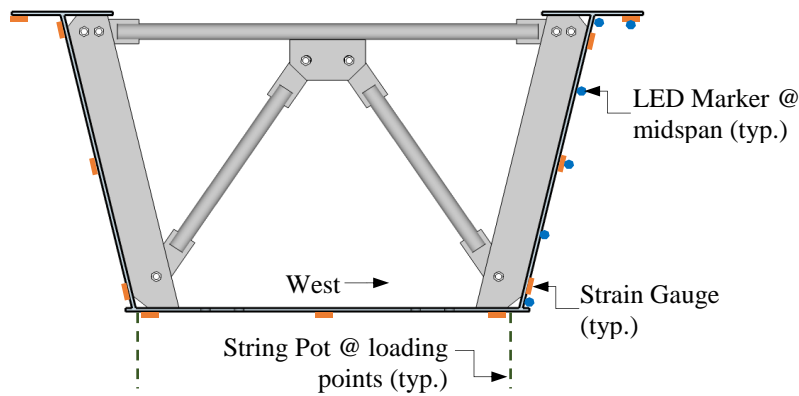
Instrumentation Layout at Intermediate Loading Point – Section
